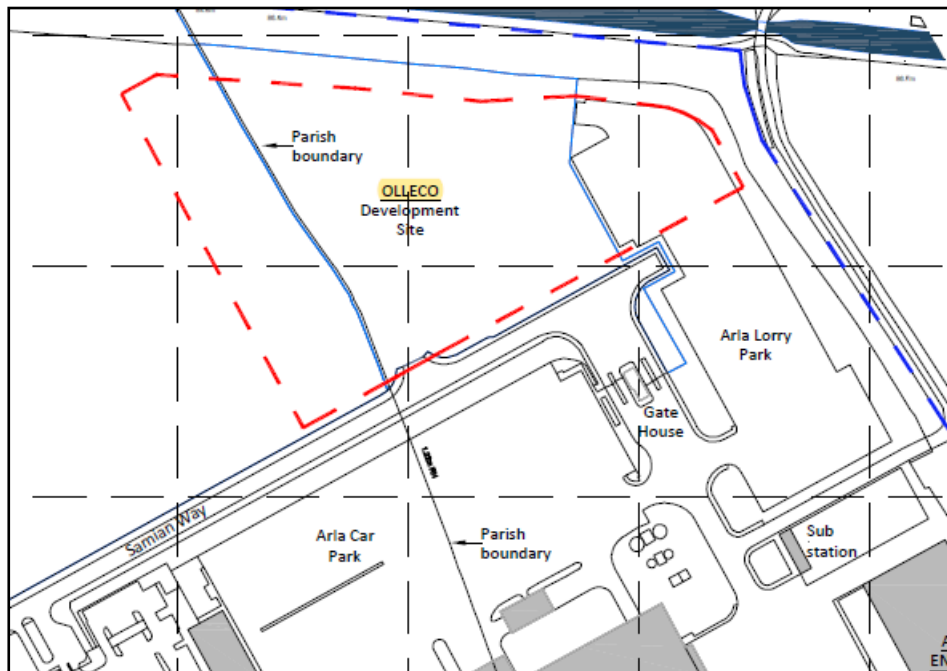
A Plan showing the Olleco Anaerobic Digestion facility (The Site) , outlined in red.
